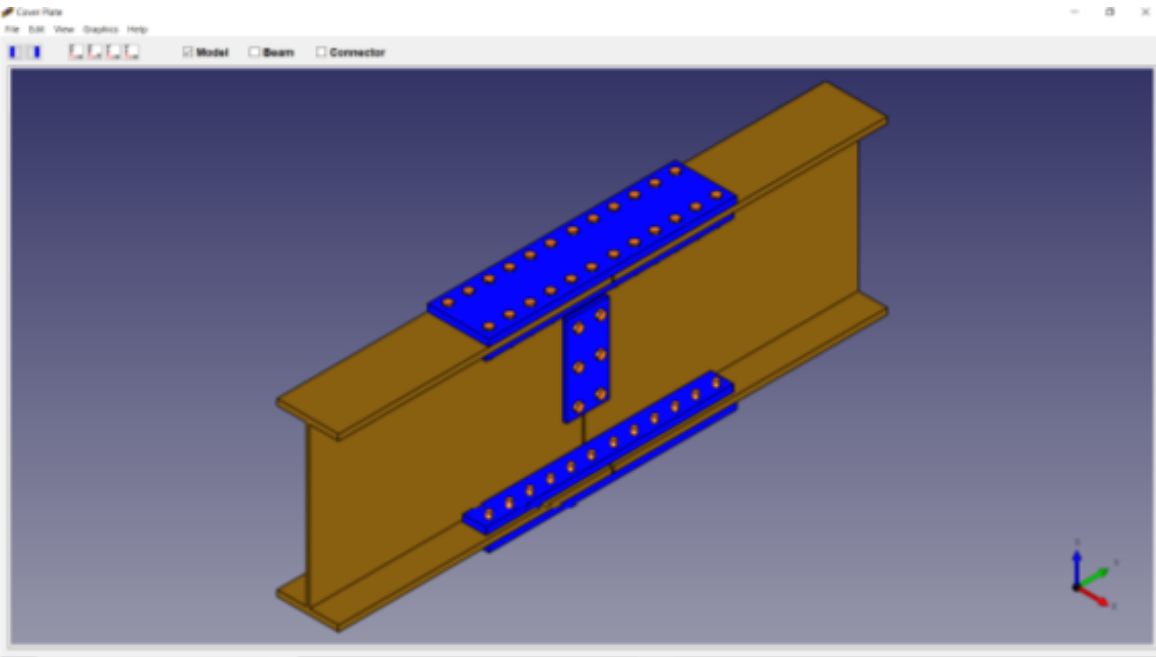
3D drawing output of typical Beam-Beam Cover Plate Bolted connection
